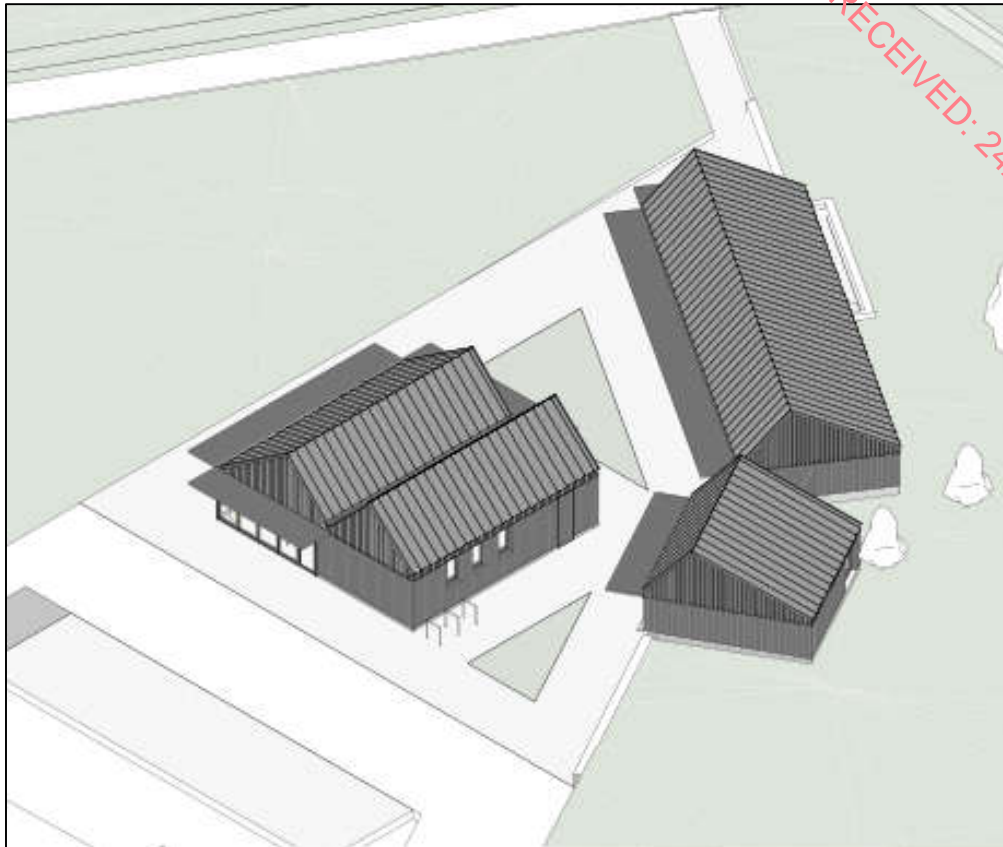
Revised and proposed layout and elevations for beach surf school and café.
